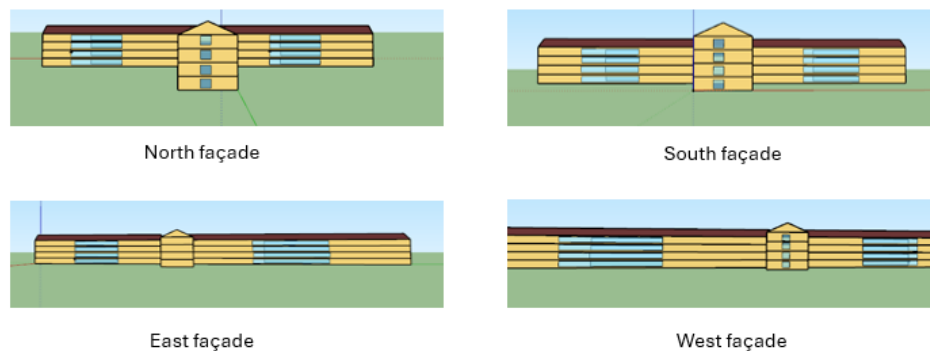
Facades of the reference building of the third building archetype (prison facility) for the Copenhagen district.
